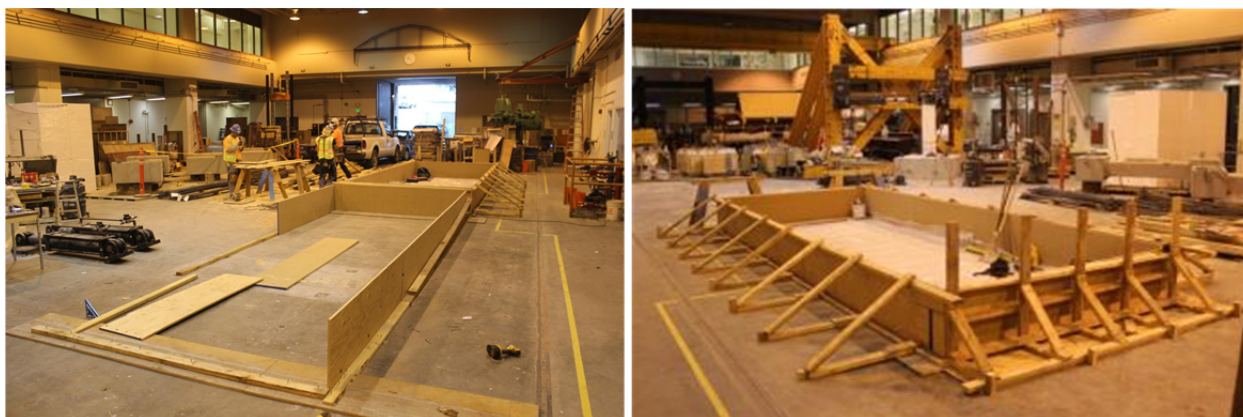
Laying out the construction space and setting up the formwork for the seat beams of the specimens.
